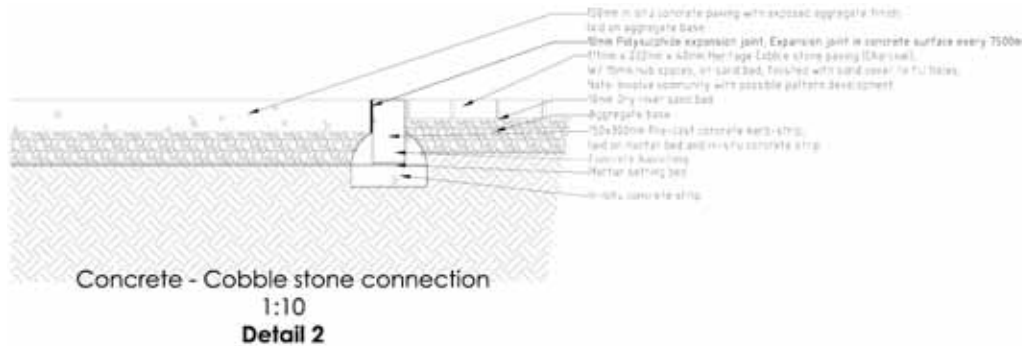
CONCRETE - COBBLESTONE CONNECTION (not to scale) (AUTHOR, 2011)
